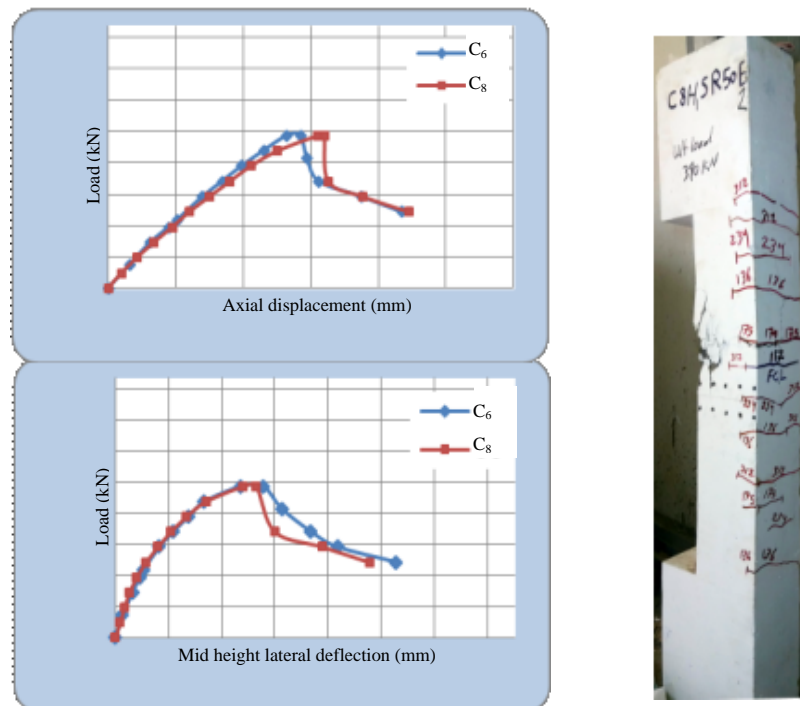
a) Load-deflection of specimen C_8 and b) Crack pattern of C_8
